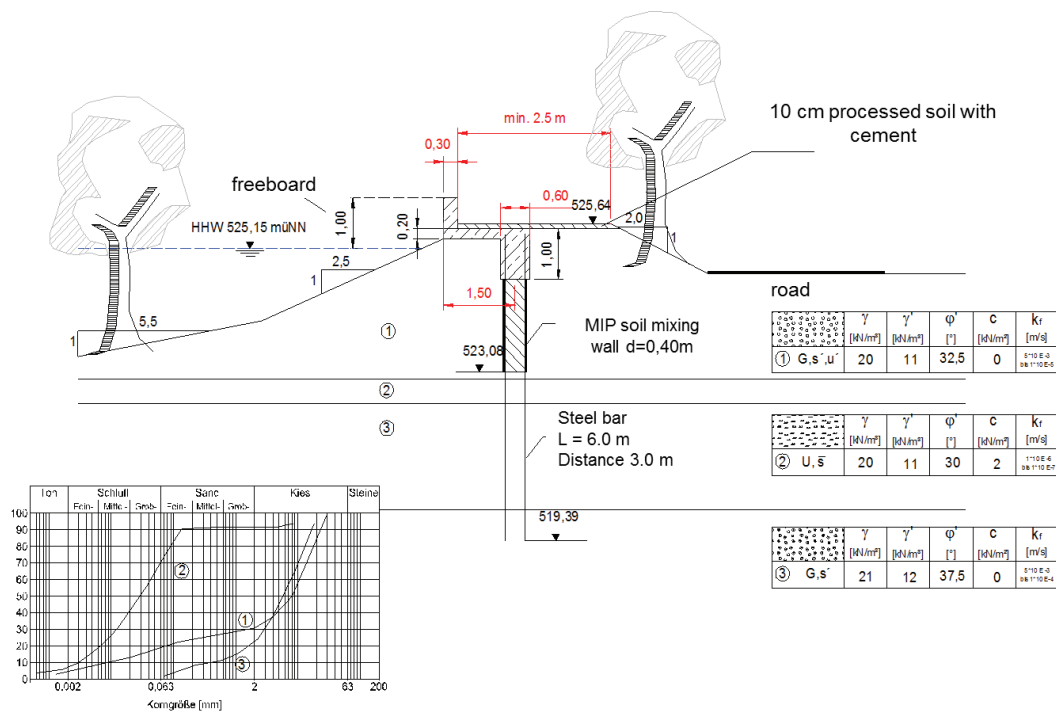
Design section of a levee in Munich at the River Isar applying soil mixing method in order to conserve trees.
